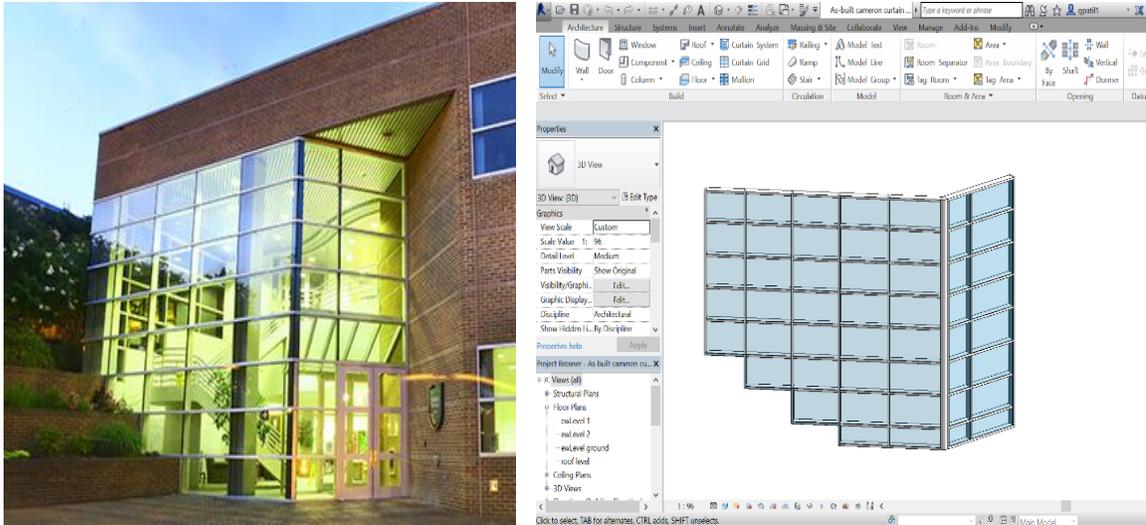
Cameron Curtain wall: Actual wall vs as-built model
